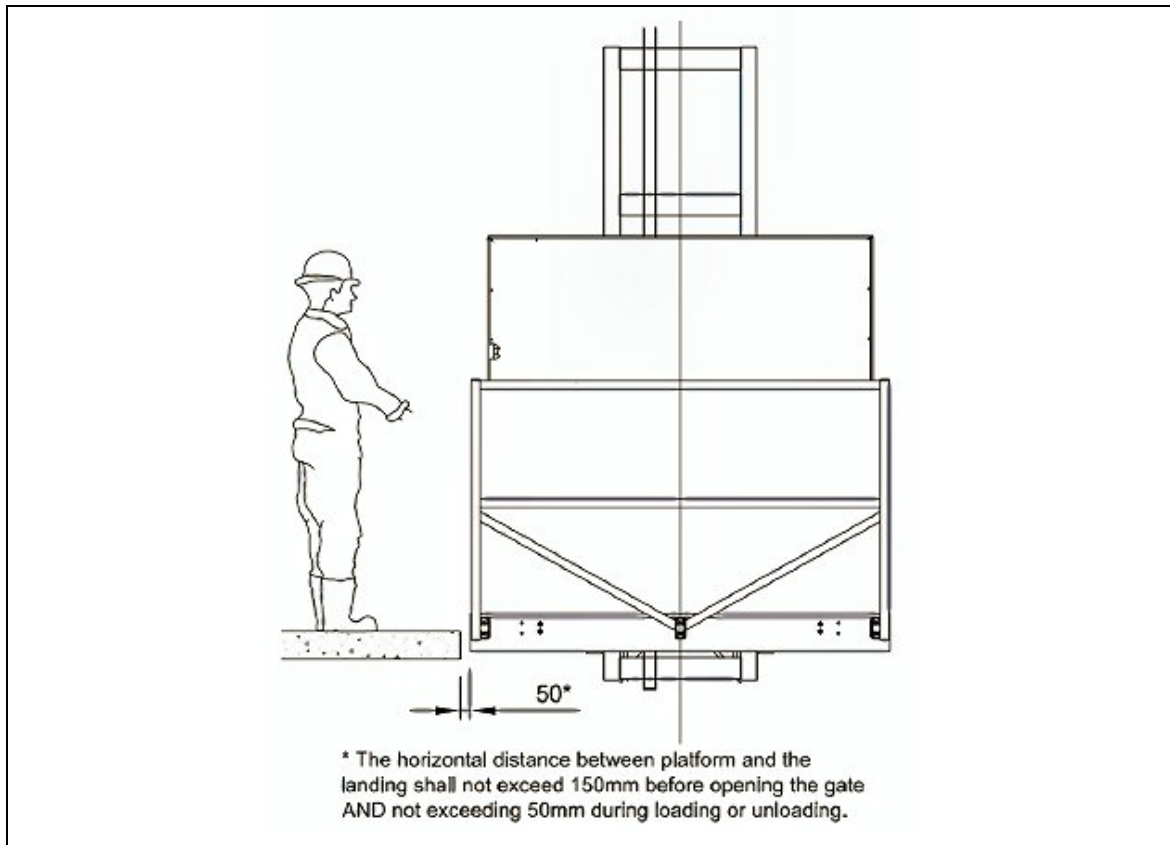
Typical Goods Hoist Without Ramp at Open Gate
